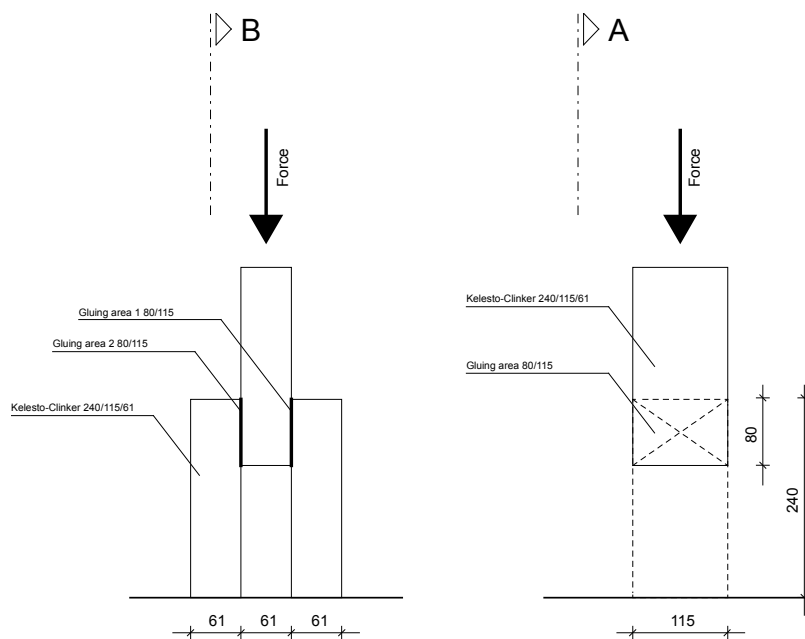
Scheme of shear test set-up: (left) Section A; (right) Section B.
